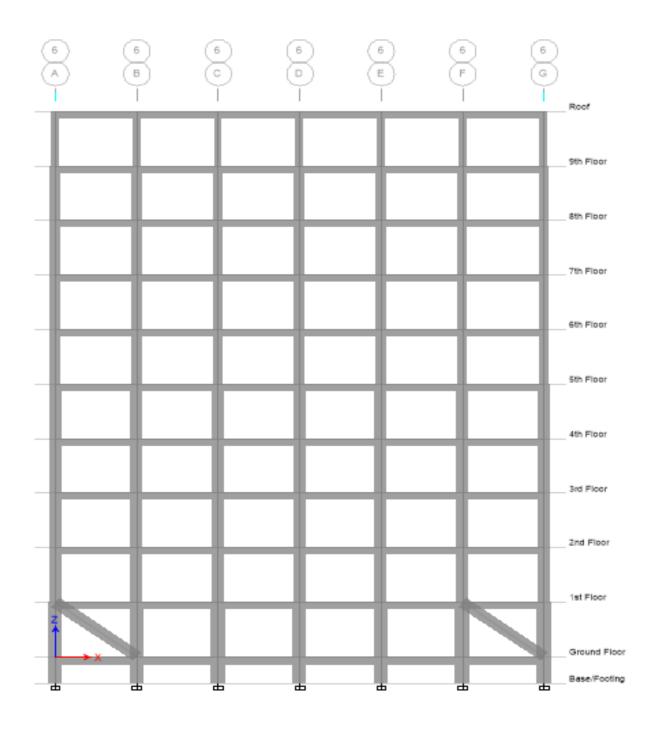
Infill wall arrangement in the modeled G+9 frame
